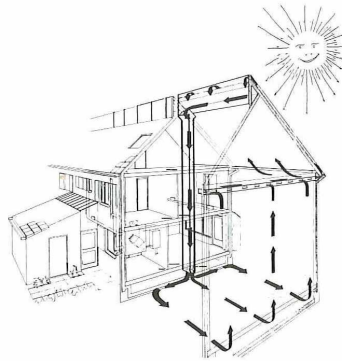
Solar cavity wall concept with a roof collector. Solar cavity wall dwellings, Hoofddorp (1984) by architect Jón Kristinsson. Reprinted from Kristinsson (2002).
